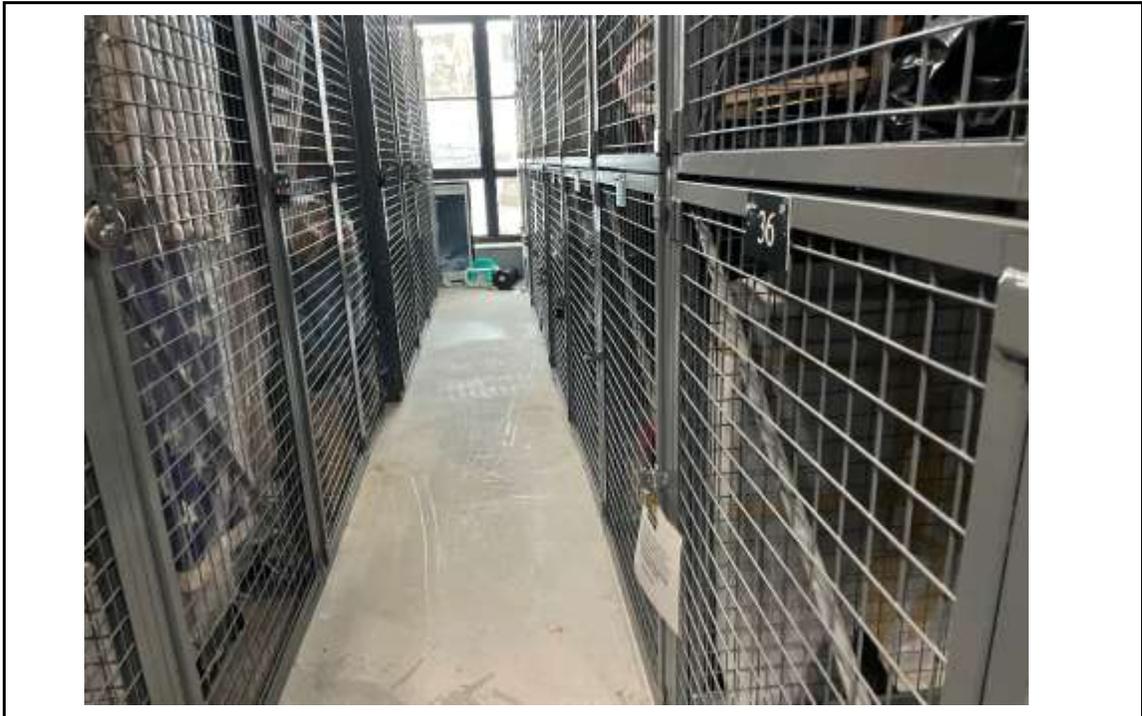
First floor concrete slab in tenant storage space, facing southwest. 02 March 2023.
